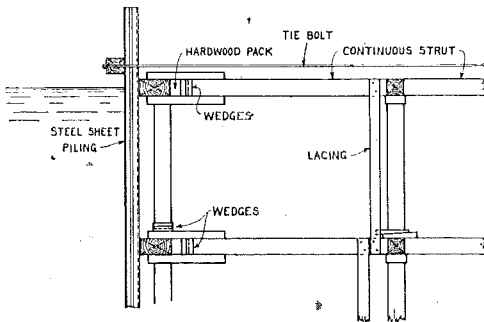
COFFERDAM BRACING WITH HARDWOOD WEDGES.
